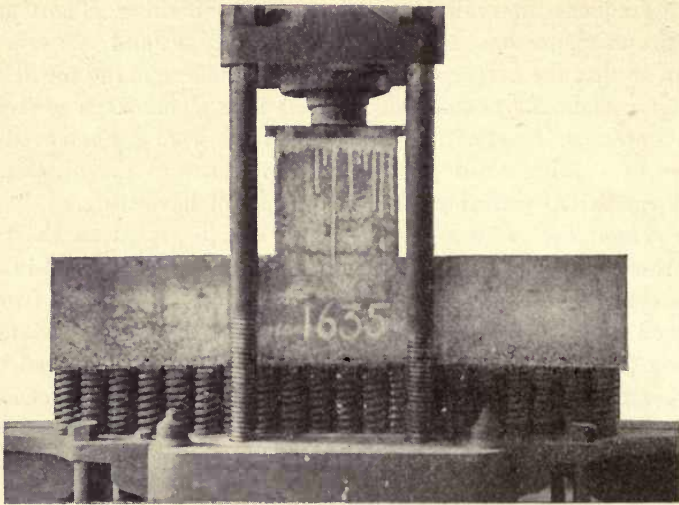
VIEW OF WALL FOOTING IN TESTING MACHINE.
